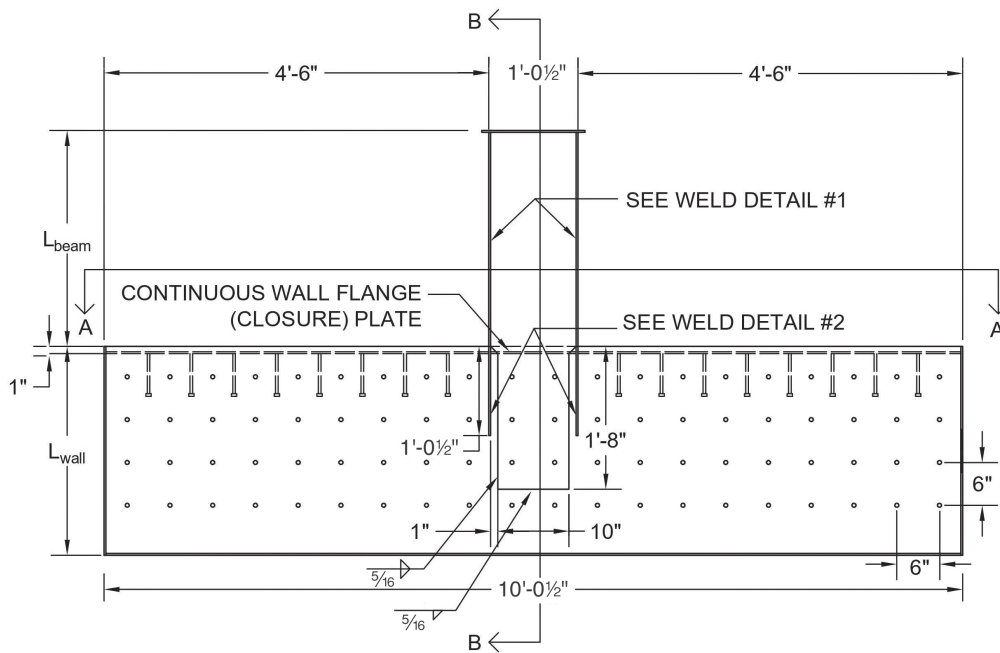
shows the elevation, section views, and weld details of specimens SP-1 and SP-3 (connection type 1) and specimens SP-2 and SP-4 (connection type 2). Figure 12 presents the same for specimens SP-5 (connection type 3) and SP-6 (connection type 4). The embedment length for the coupling beam flange and the lap length for the coupling beam web is also identified. The flange embedment
